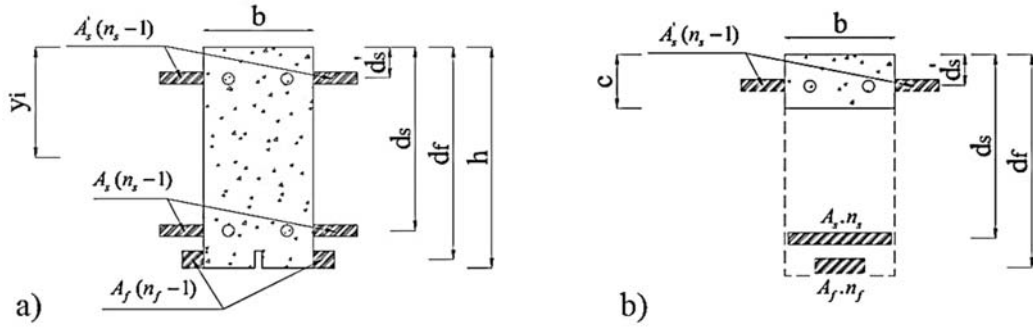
Transformed cross section for: a) uncracked section, b) cracked section
